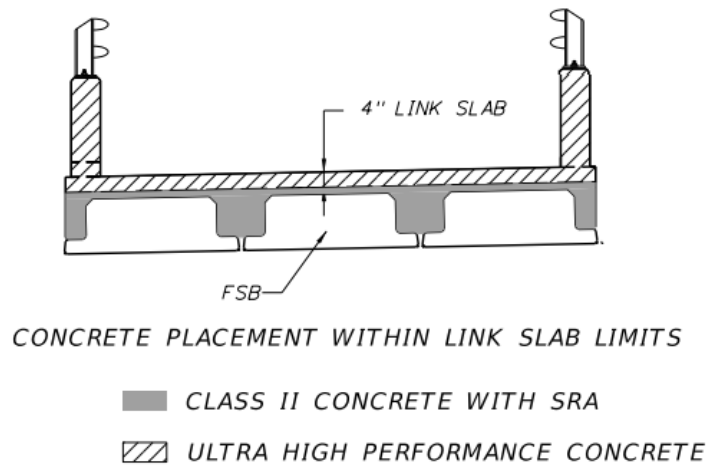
Concrete within the link-slab (Bridge No. 019004)
